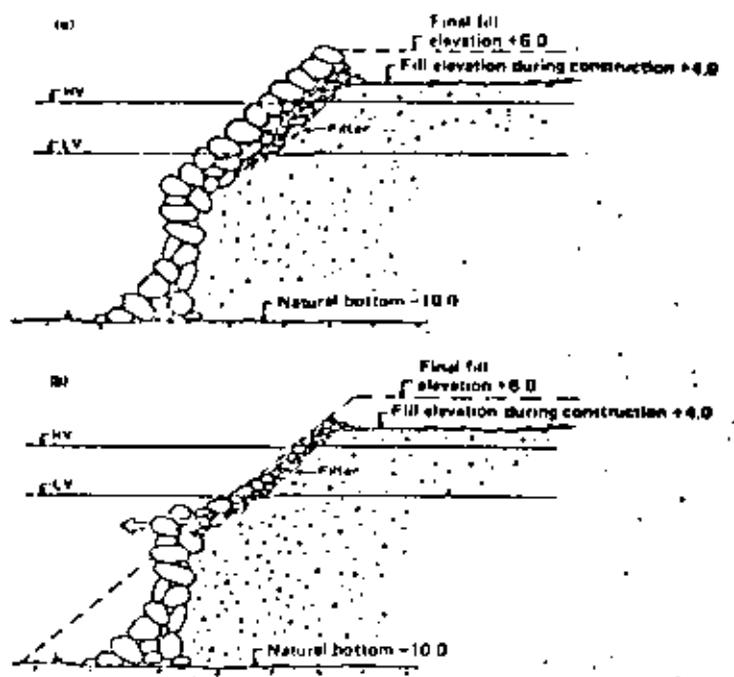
A. An unstable break water head, built up on a steep slope below water.
